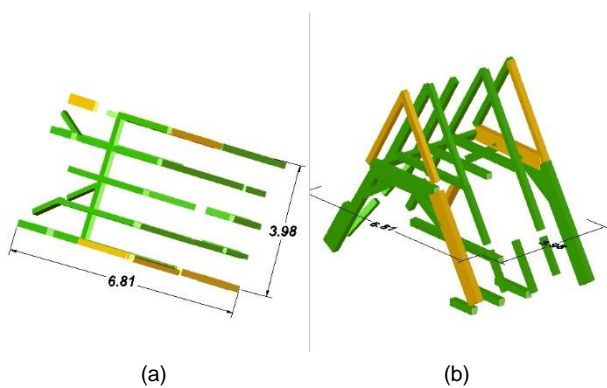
Automatically-reconstructed beams represented by their best fitting cuboids (colours show fitting accuracy):
